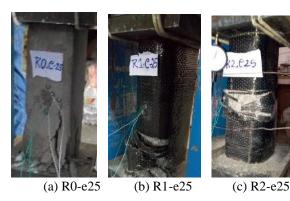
Modes of failure of specimens loaded at 25mm eccentricity
